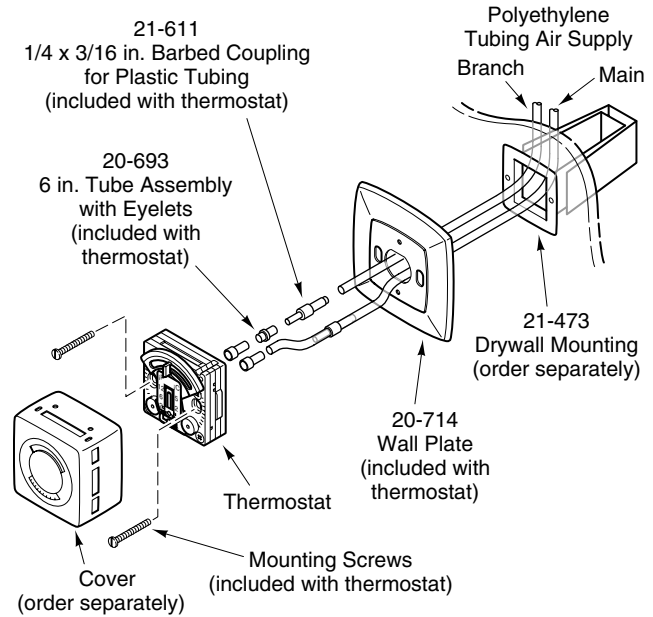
Flush Mounting of Thermostat, Using Drywall Mounting Bracket.
